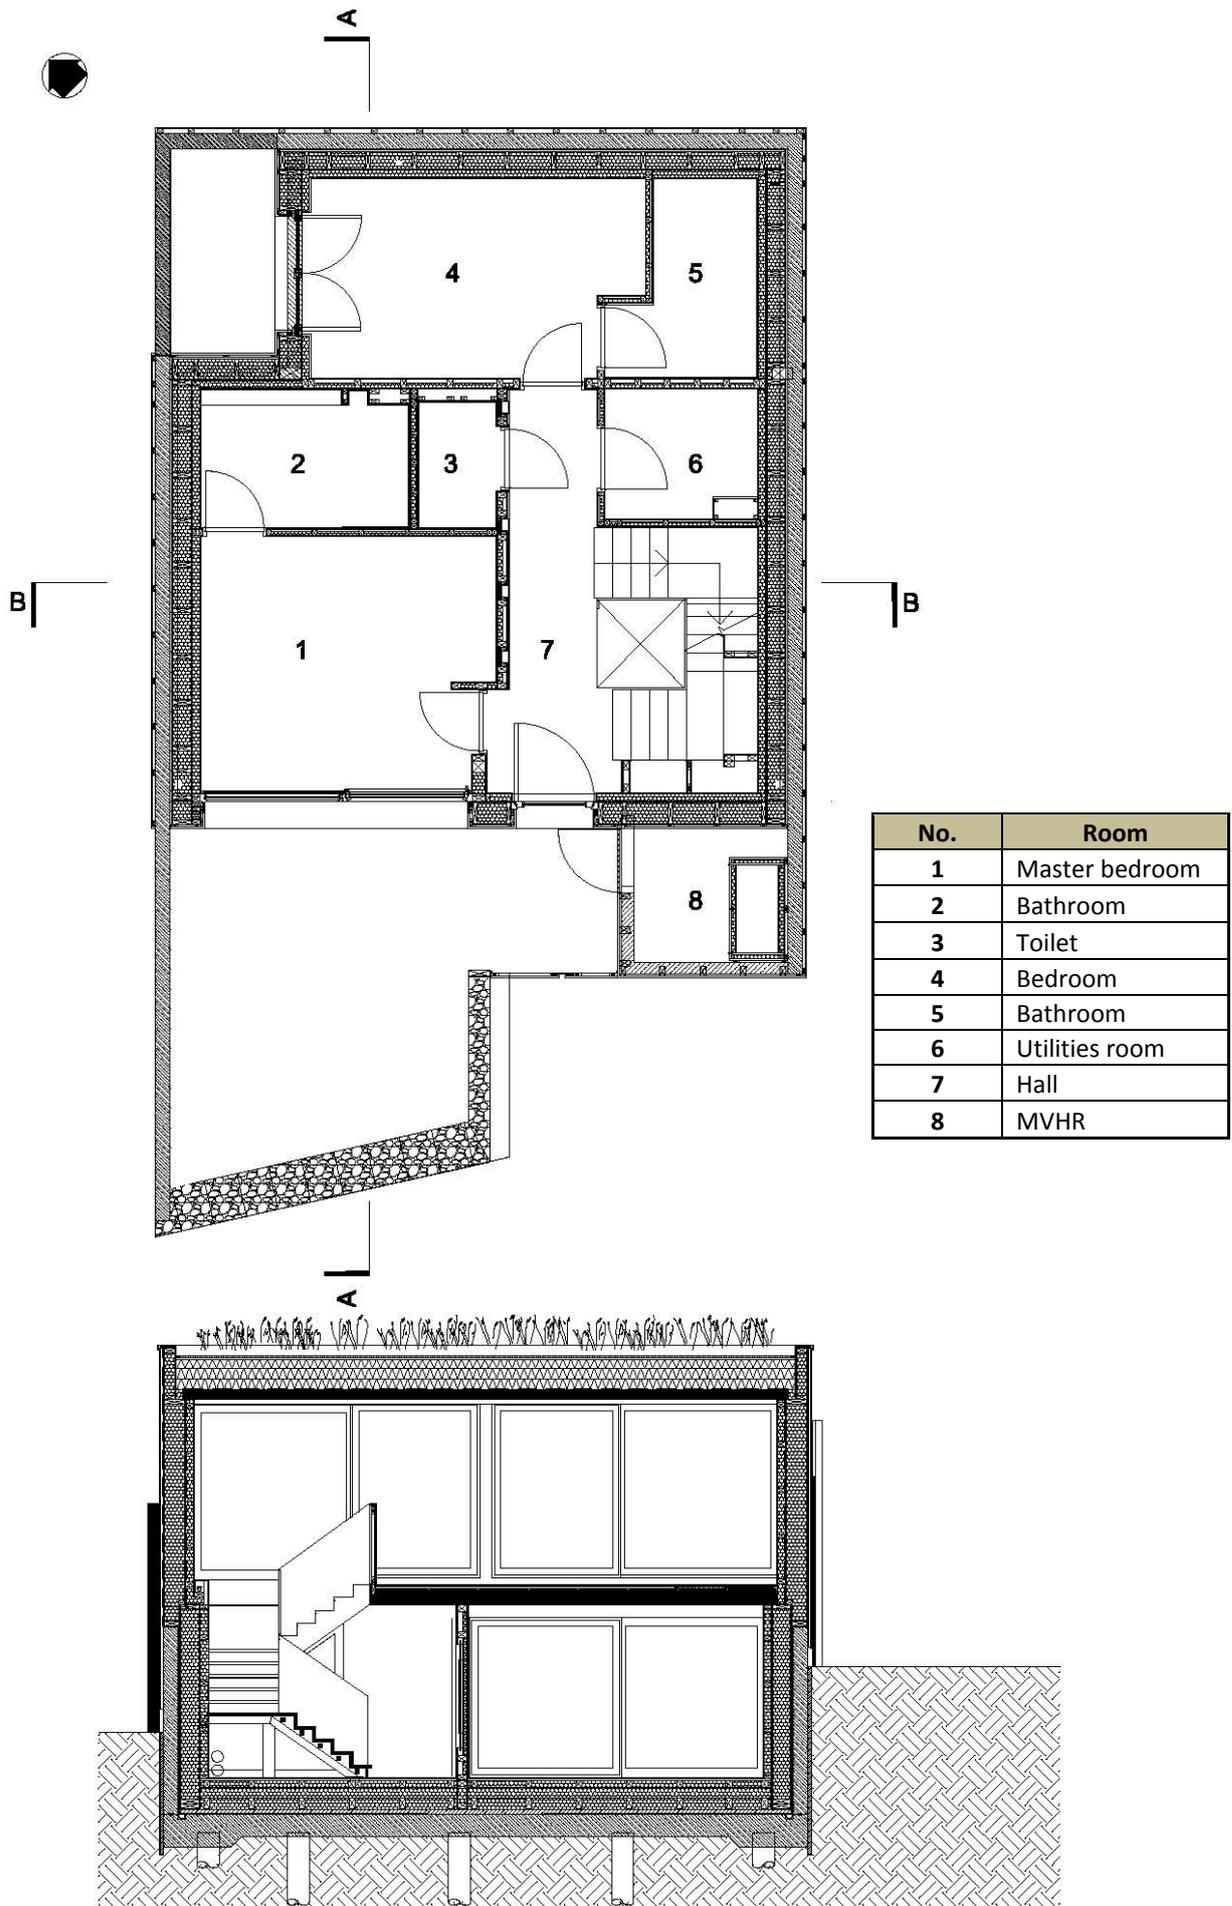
Ground floor and cross-section B-B, S=1:100 (Bere: architects, 2009)
